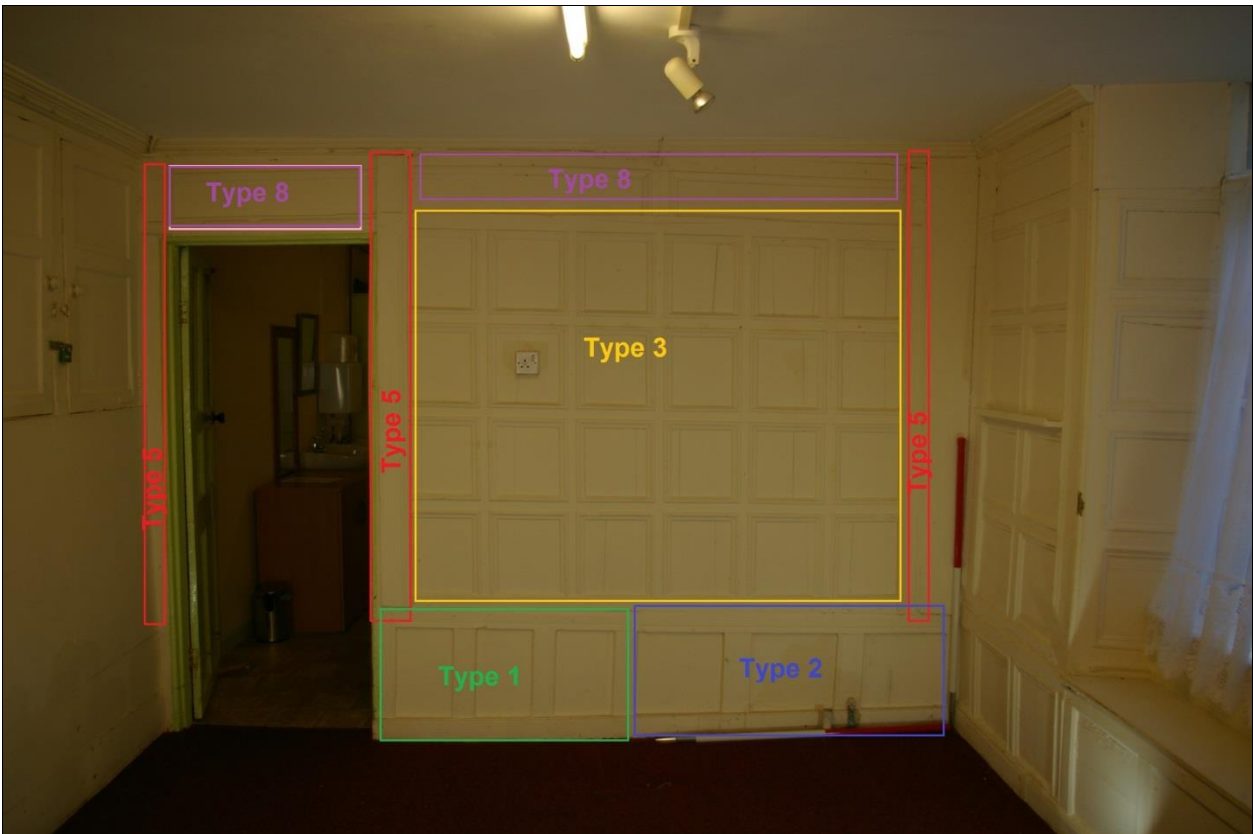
NORTH WALL, WITH ANNOTATED PANELLING TYPES.
